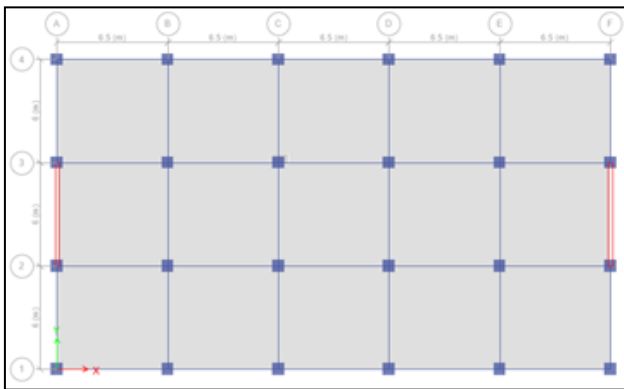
Model 2 – Floor Plan of the Dual System with Shear Wall on Side of the Structure
